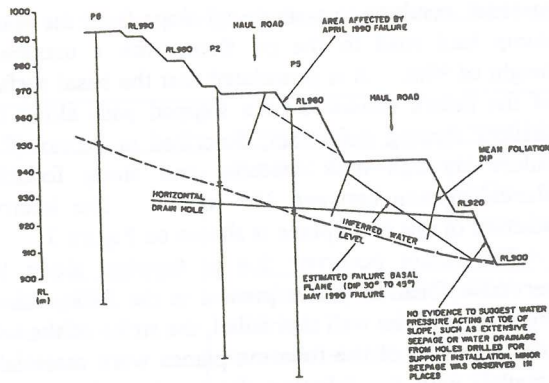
SECTION THROUGH COLLAPSED WALL, PAD 1
